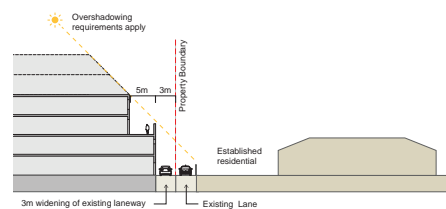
Acceptable outcome for a laneway interface, 3m setback used to widen existing laneway. Diagrams demonstrate an indicative built form envelope only.
